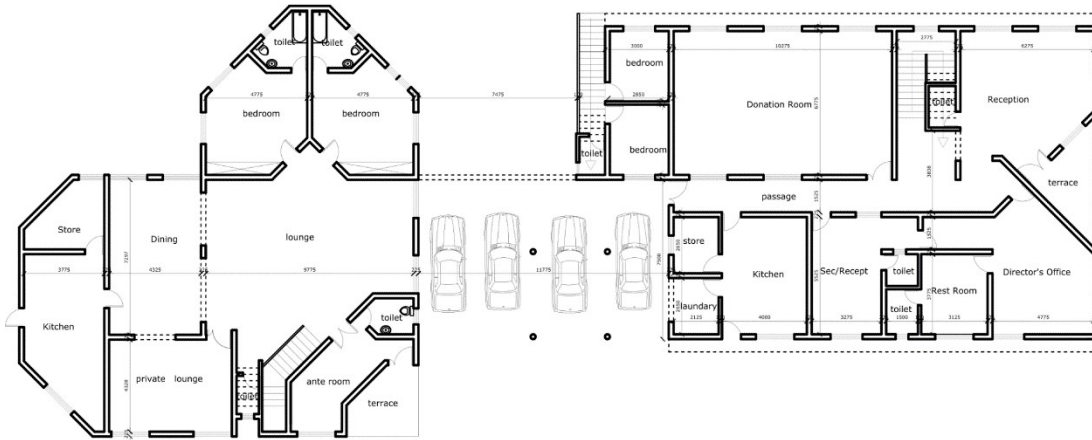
Image Showing the Hearts of Gold Ground Floor Plan
